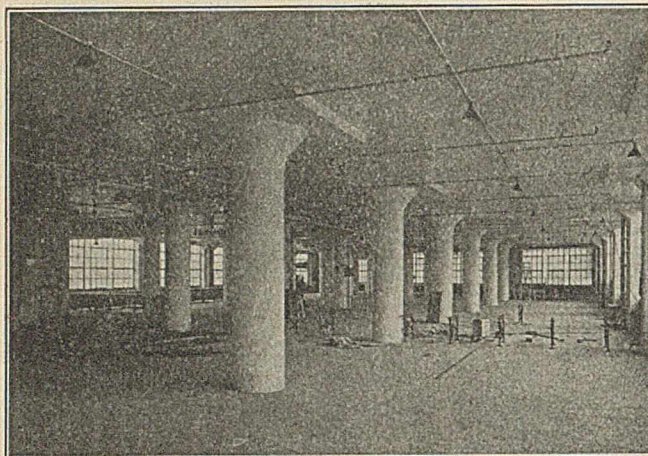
SHOWING FIRST FLOOR OF STEWART BUILDING, JANUARY 15, 1918
